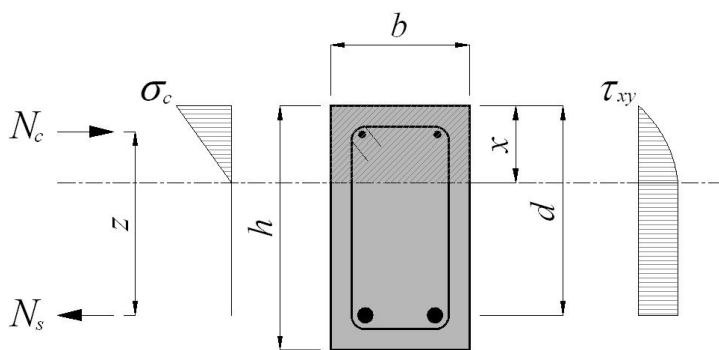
Normal and shear stresses over the depth of cracked reinforced concrete beam [WALT1999]
